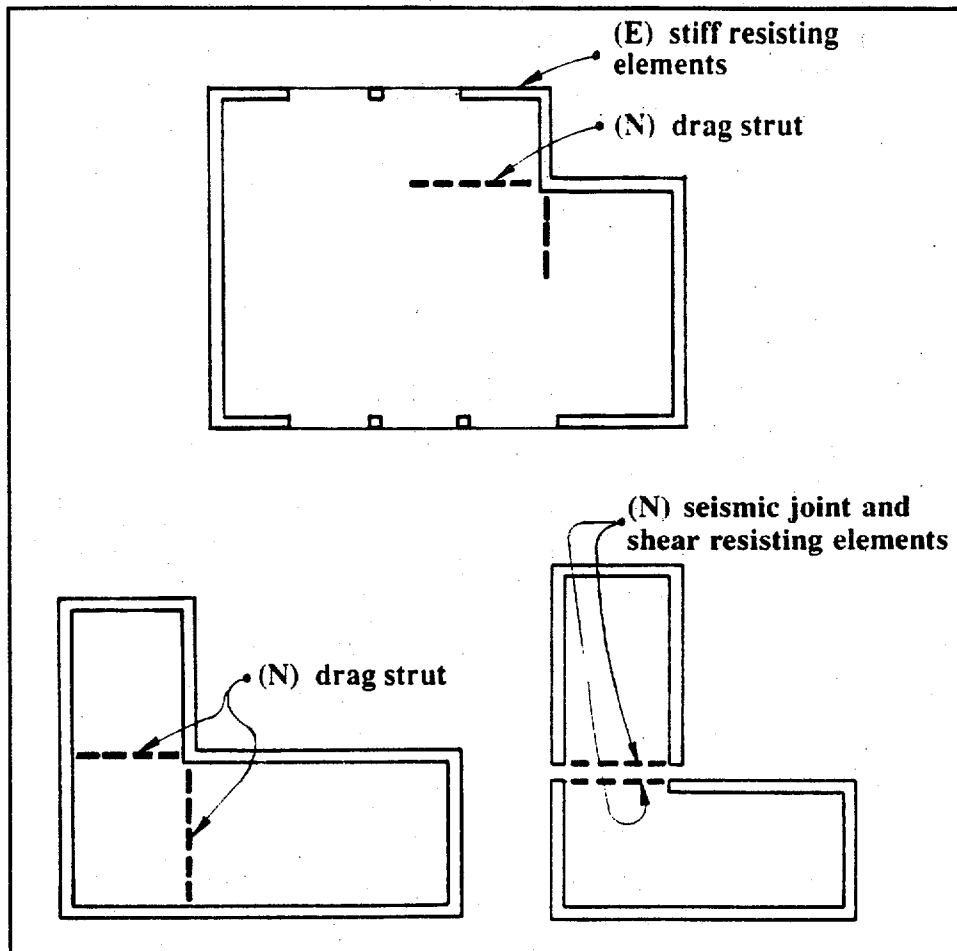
Horizontal or plan irregularities--rehabilitating buildings with re-entrant corners.
